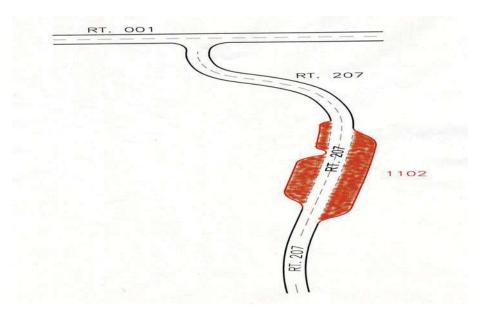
Parking with access route 207 running through and continuing beyond parking 1102. This access route cannot be considered a part of the parking area and two routes and two assets continue to exist.
